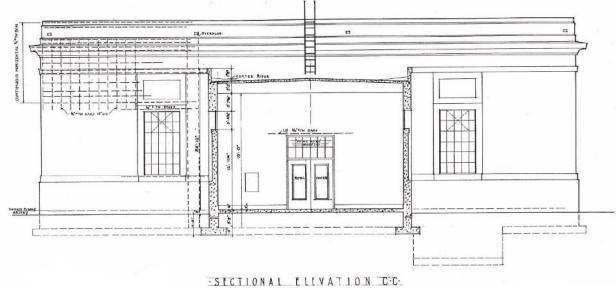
Capistrano Substation detail, rear elevation, 1917.
